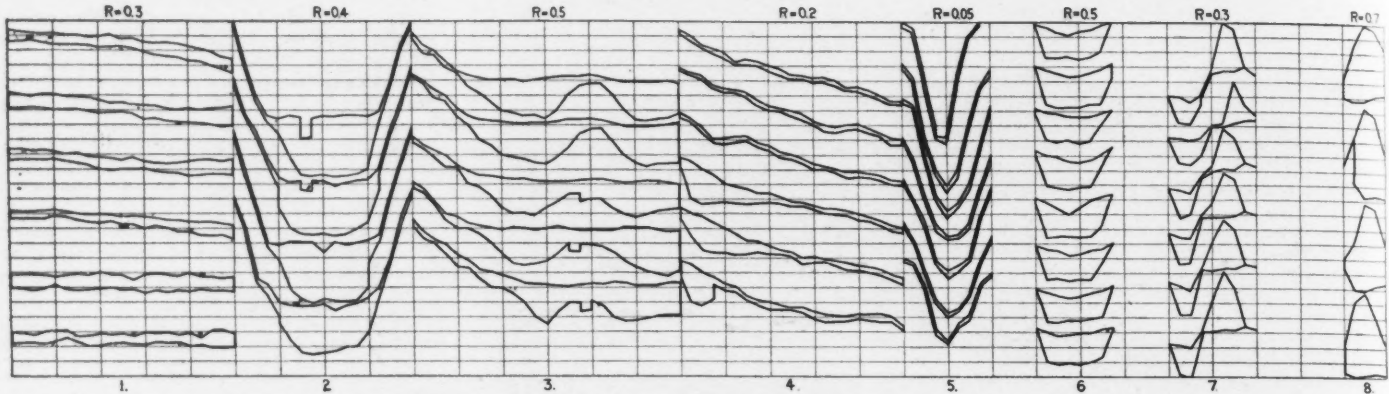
TYPICAL CROSS-SECTIONS PLOTTED ON "PLATE B" PROFILE PAPER FOR PLANIMETER CALCULATIONS.
